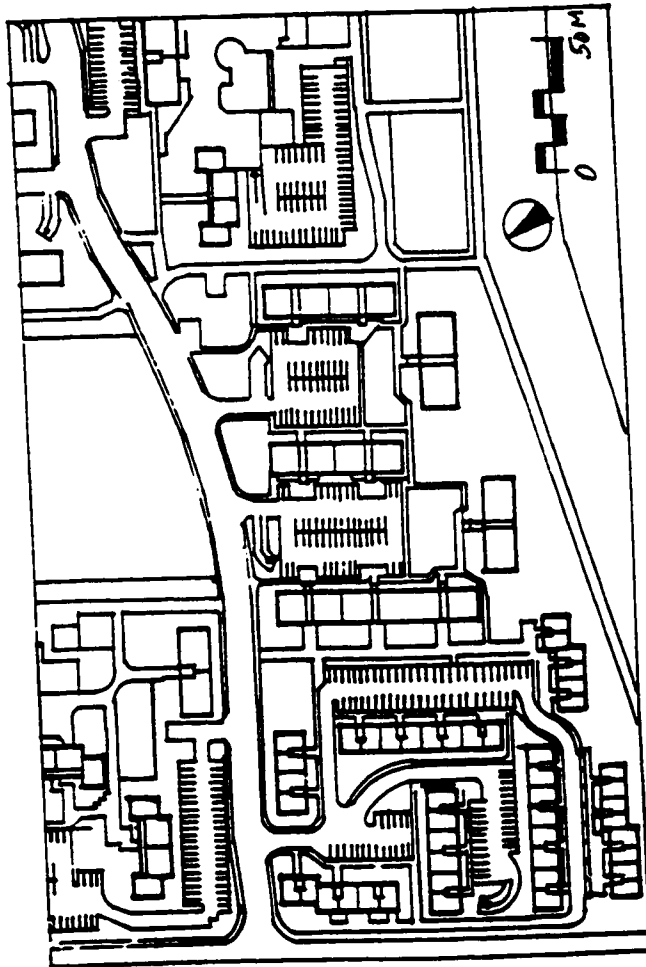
Site layout plan of Bundang Hyundai apartment complex
